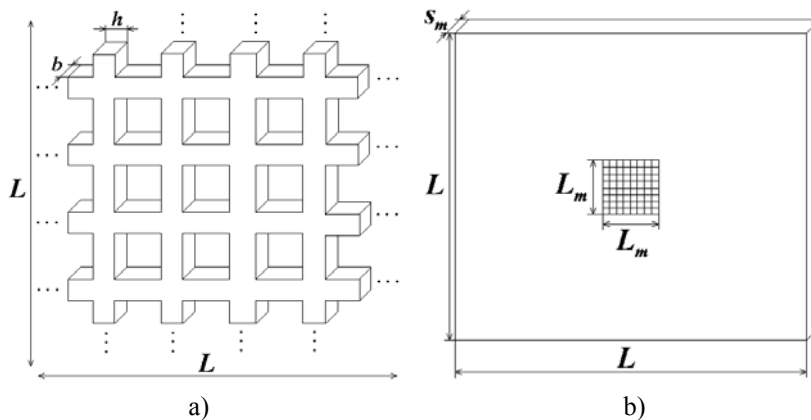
The girder (a) and equivalent membrane with integrated girder (b)
